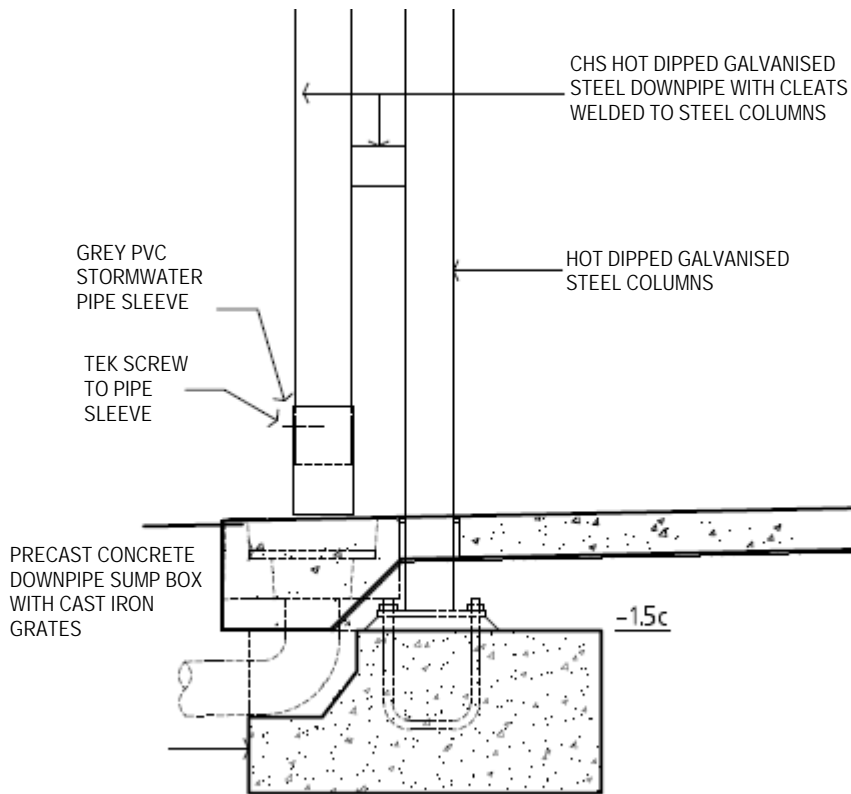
A downpipe detail from the primary school brief that prevents wash to paving and is not a trip hazard.
